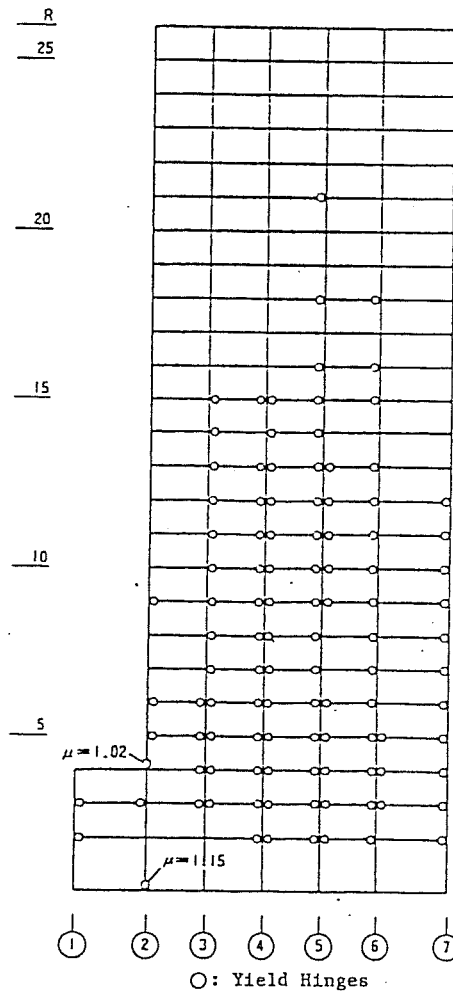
Yield Hinges of Beams and Columns at Earthquake of 40 Kine (G Frame)
